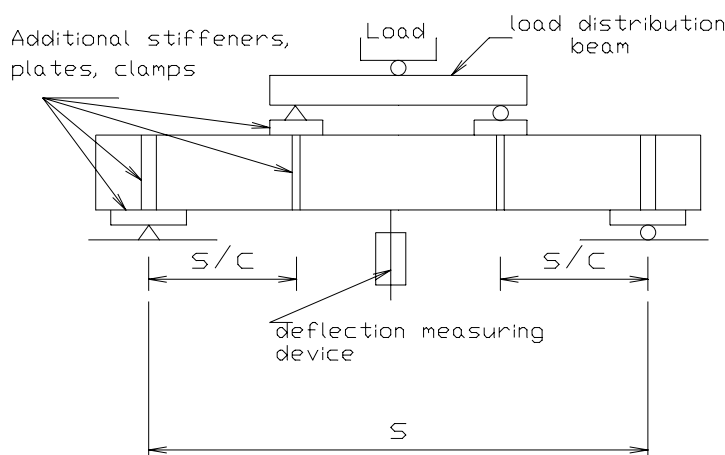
Simply-Supported Pallet Beam Tests.
